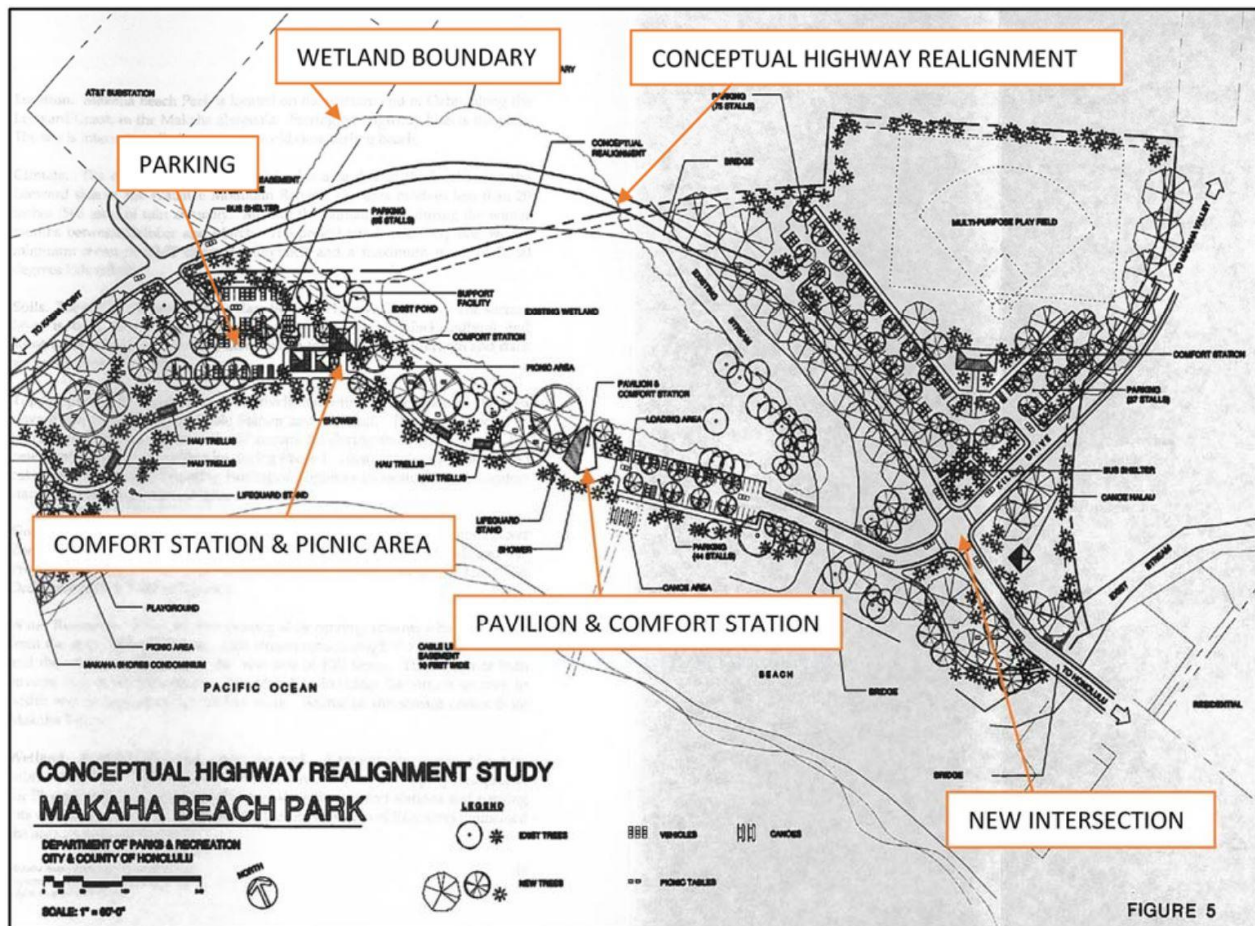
Mākaha Beach Park Master Plan Conceptual Highway Realignment (Source: Mākaha Beach Park Master Plan Report (1998)).
